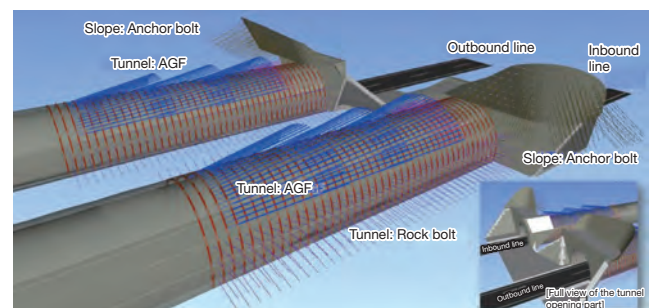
Three-dimensional model of slope countermeasures and tunnel auxiliary construction method (showing the inside of the ground)
